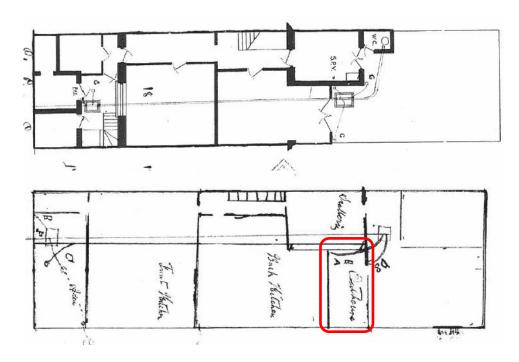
Drainage plan of No.18 (top) and No.16 (bottom)
